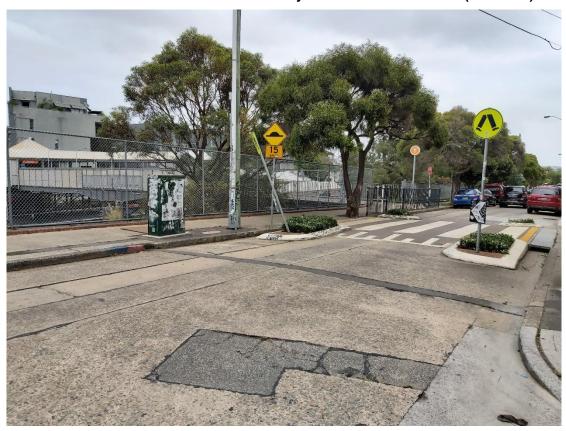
Lord Street station entrance showing footbridge, pedestrian zebra crossing and bicycle loops (RPS 2020)
